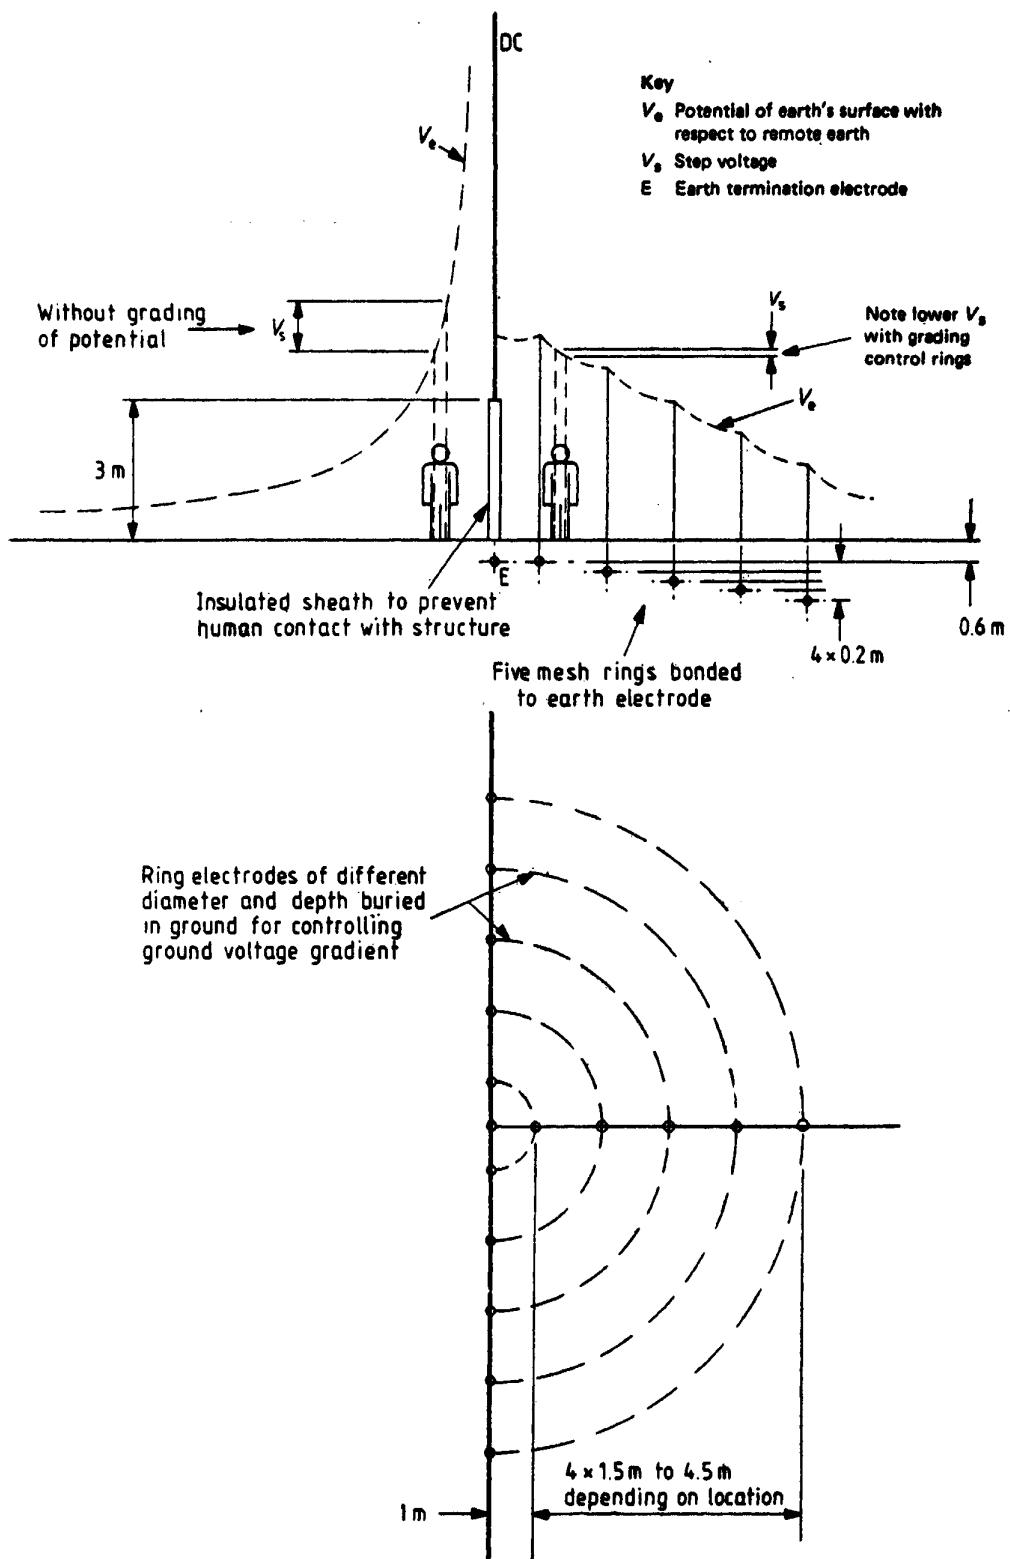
VOLTAGE GRADIENTS ALONG GROUND SURFACE NEAR TO MASTS, TOWERS, COLUMNS AND SINGLE DOWN CONDUCTORS ON BUILDINGS
